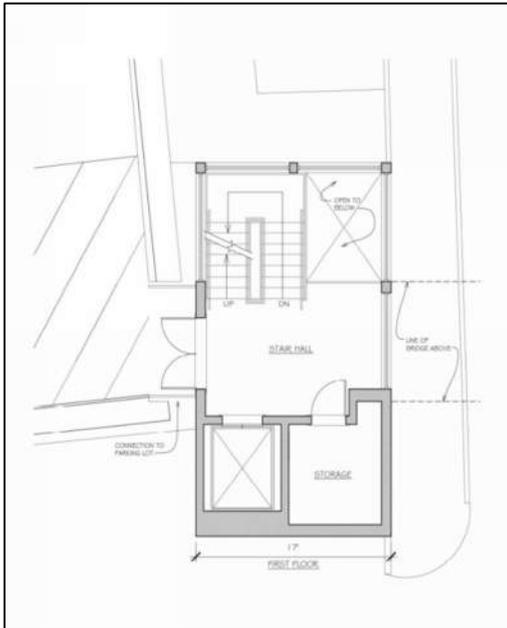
Sky Bridge First Floor Plan, Alternative 4a (DeStefano Architects, 2013)
